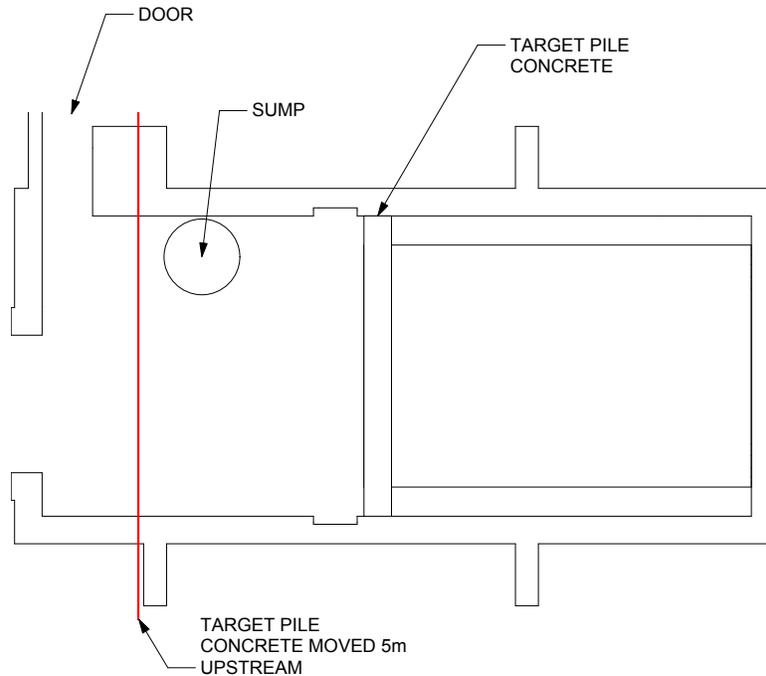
Plan view of target hall showing front face of existing target pile and location 5m upstream. The door is not blocked, but the sump would be covered.
